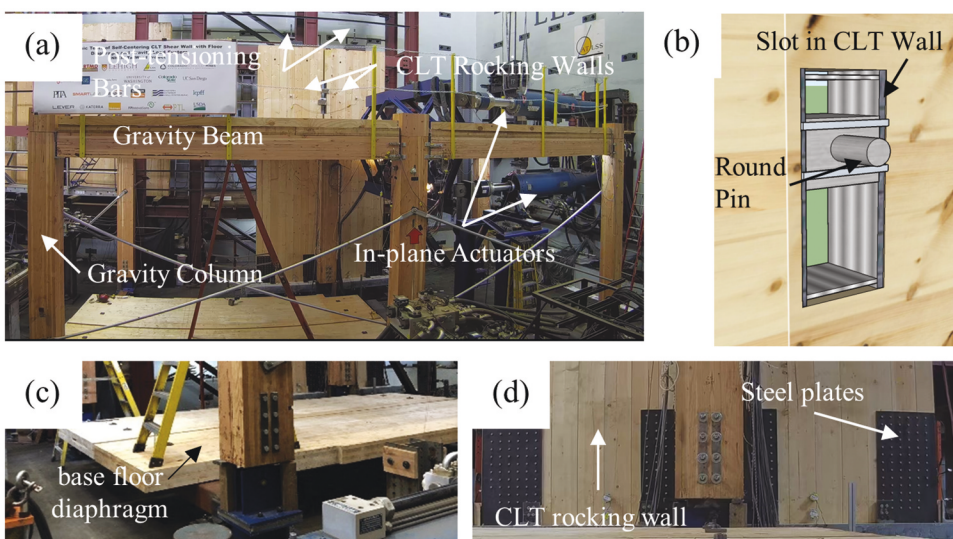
Structural test specimen; (a) test specimen, (b) collector-beam-to-CLT rocking wall connection, (c) base floor diaphragm, (d) repaired CLT rocking wall.
